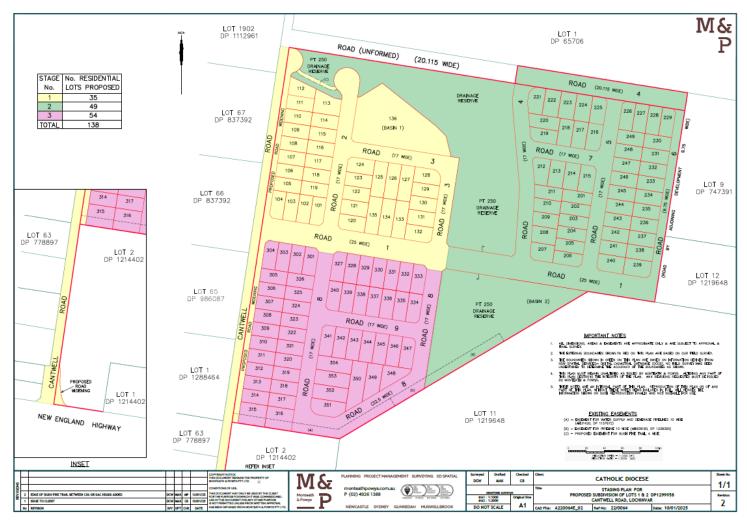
Staging Plan of Proposed Subdivision (Monteath and Powys)
